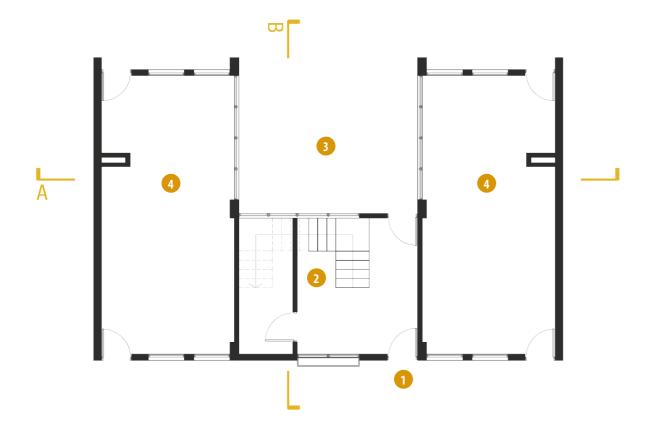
TYPOLOGY F\_GROUND FLOOR PLAN
